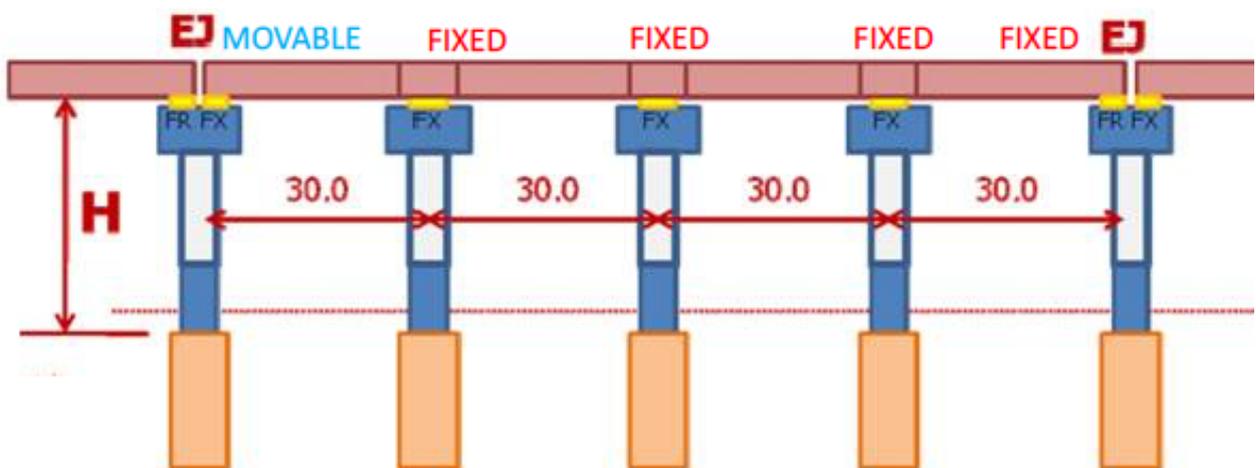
Beam connected to the columns by structural bearings (movable and fixed)
